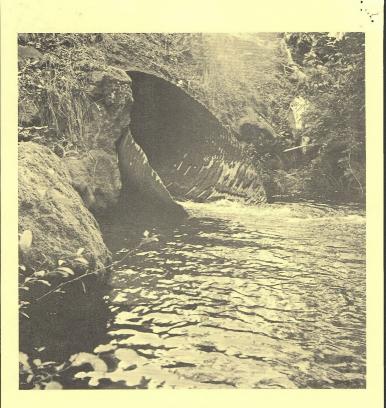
GOLD CREEK - Culvert outlet after dams were built.
